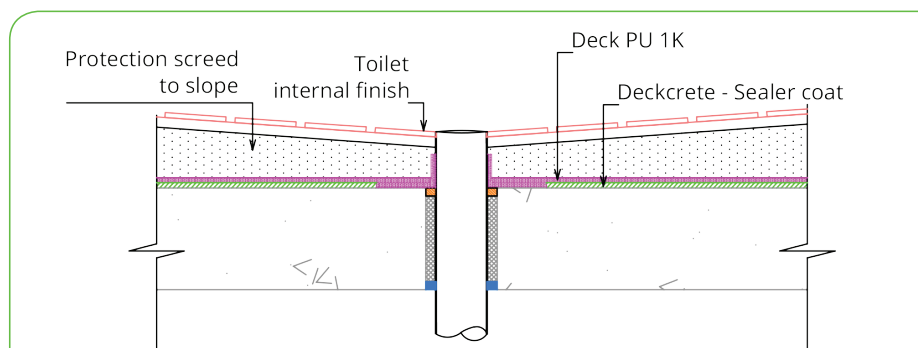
DRAIN OUTLET DETAILS AT TERRACE LEVEL
